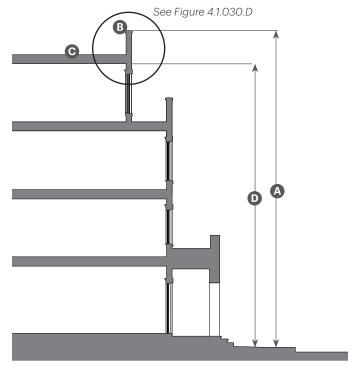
C Highest Top Plate for parapet and flat roof.
